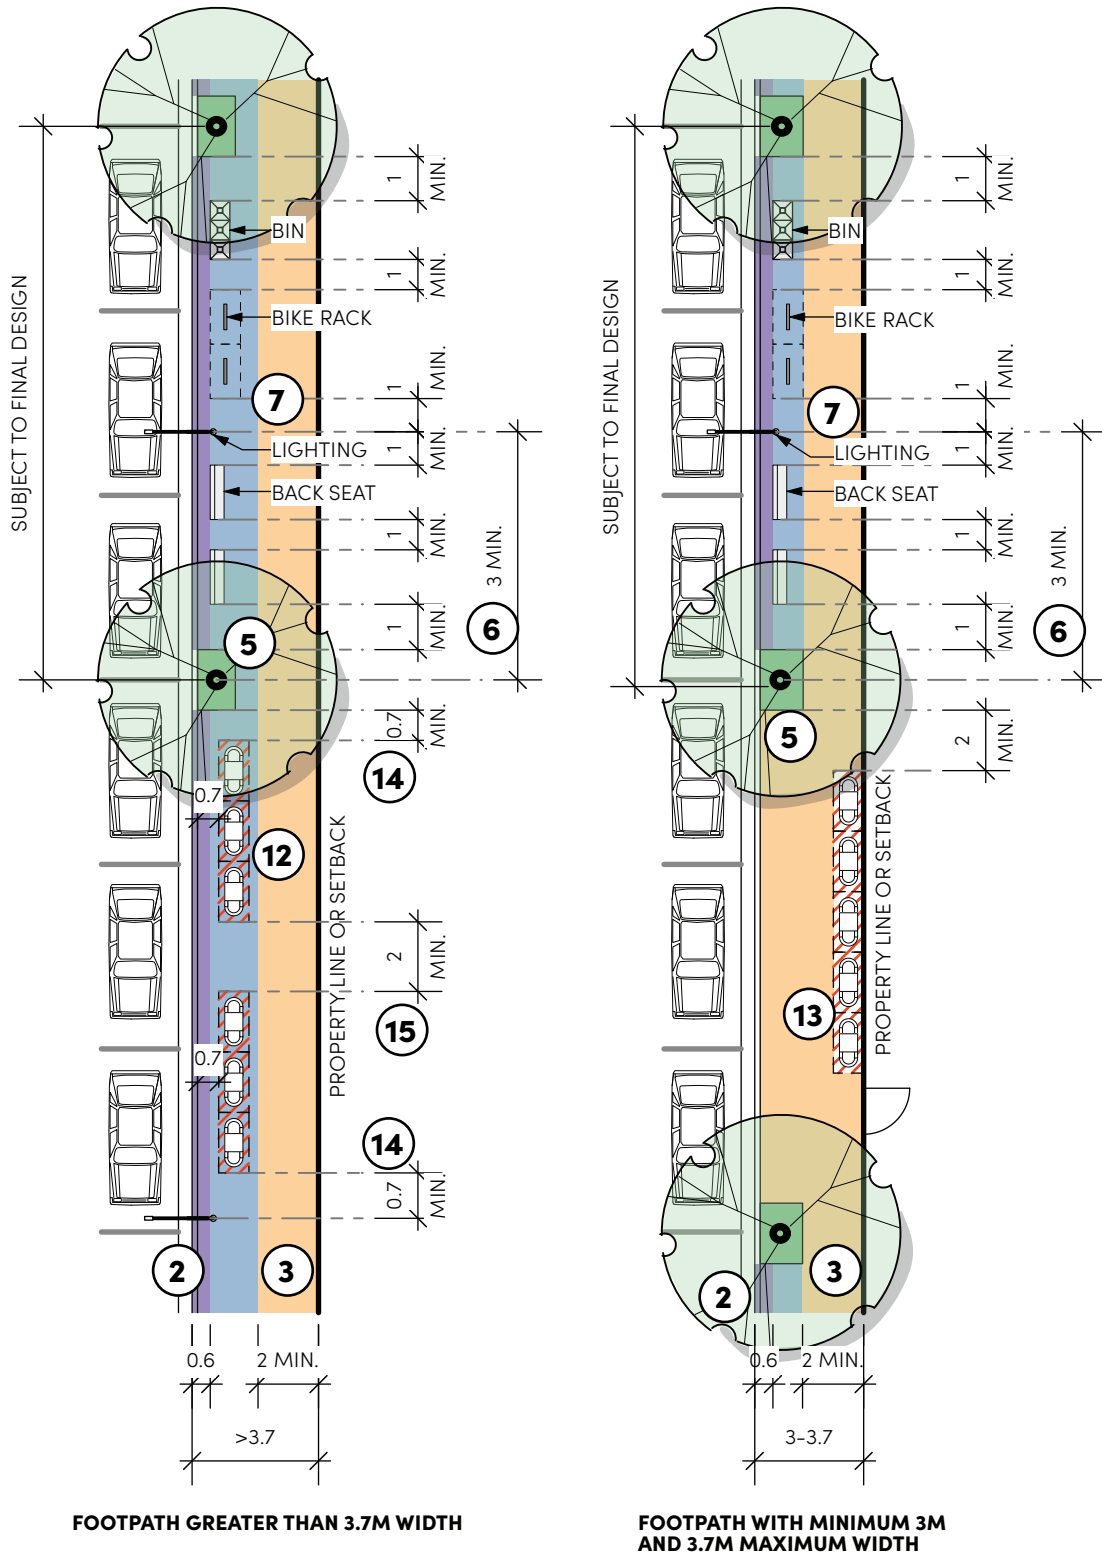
Typical Fully Paved Footpath Arrangement
